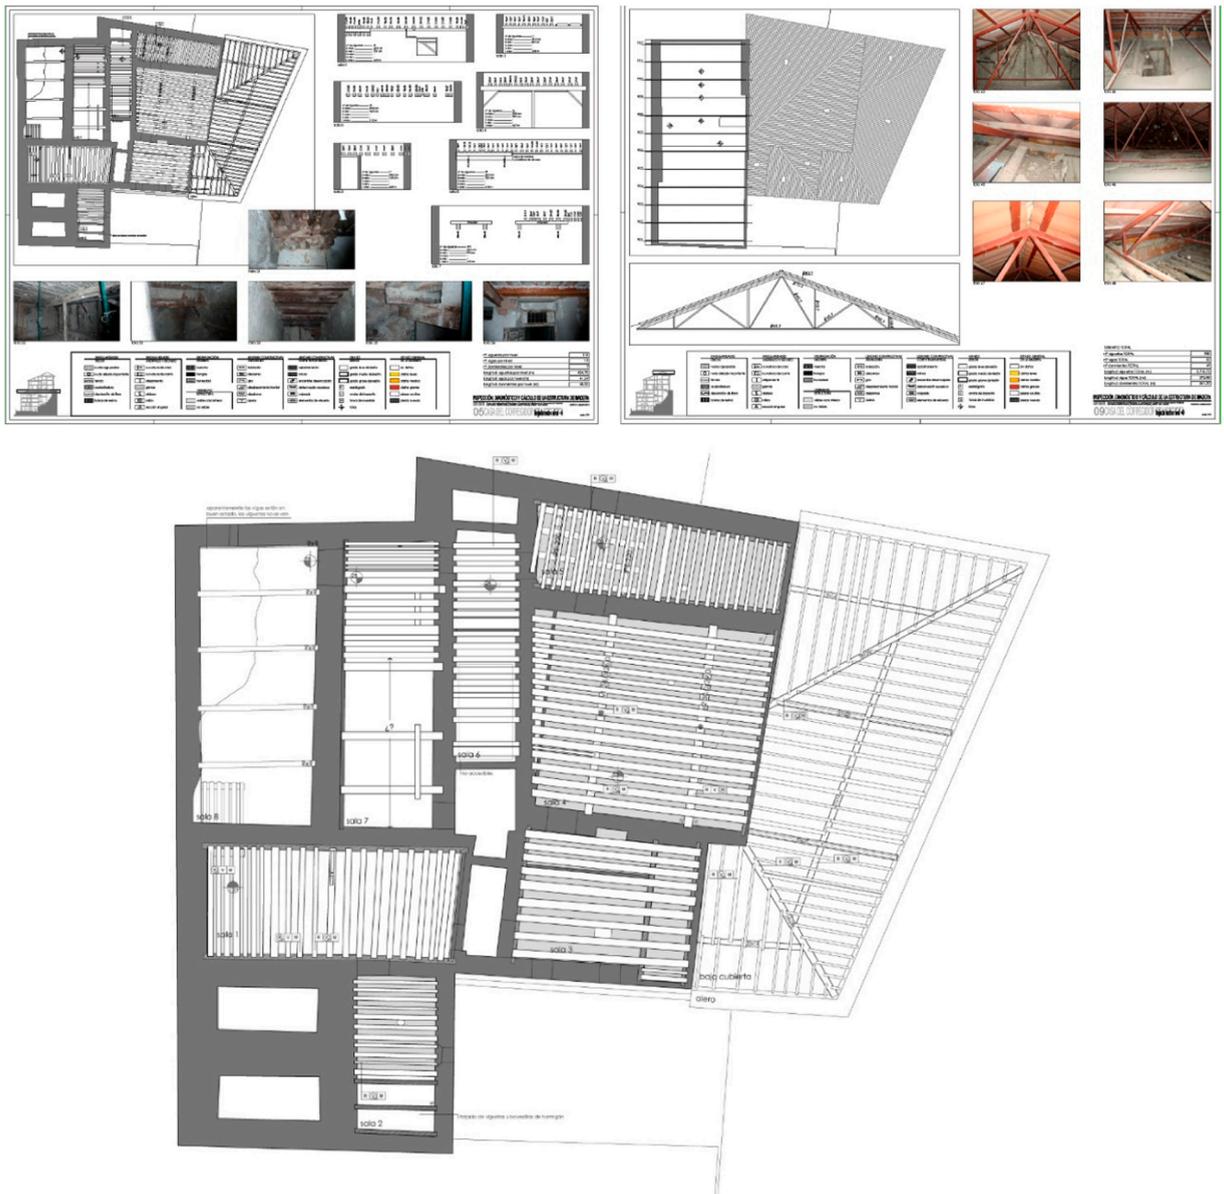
Some examples of structure descriptive plans. All plans are available for consultation in [hq](#) in [17].
